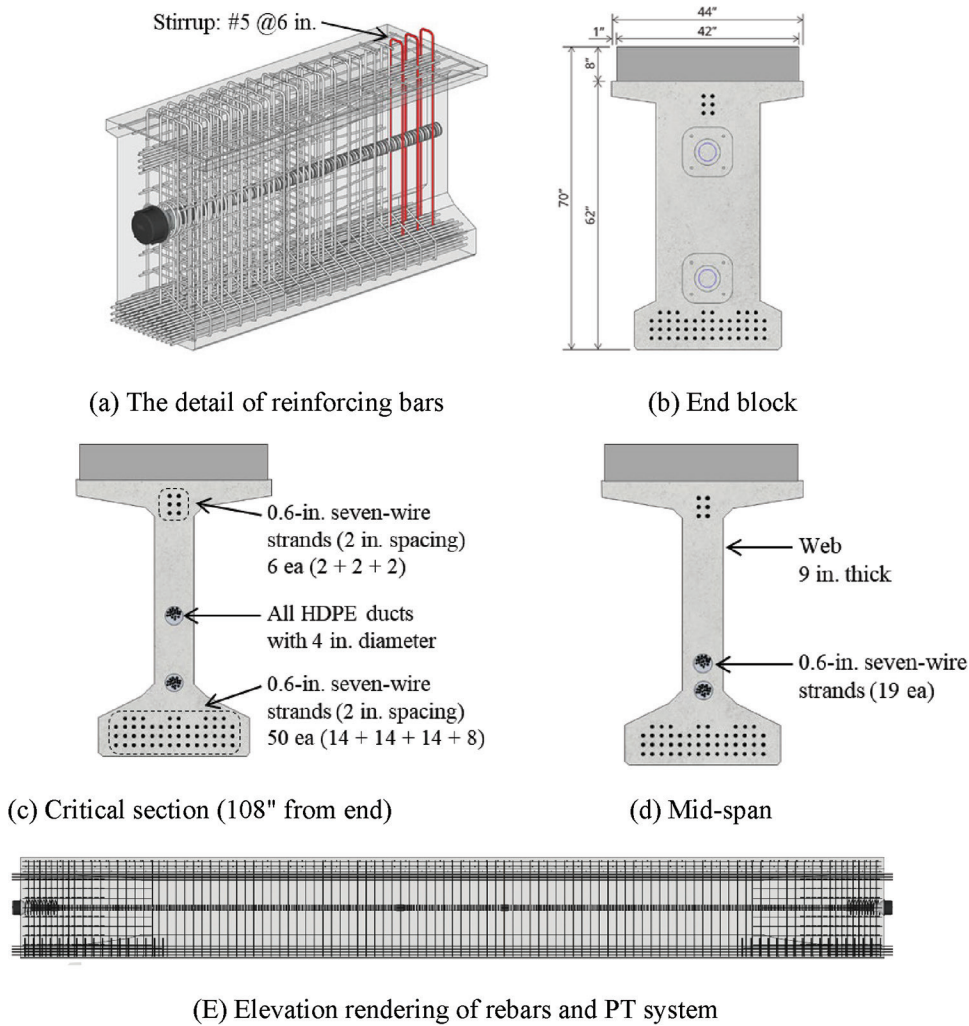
Details of reinforcing bars and cross sections of test specimens of Tx62-PSG and Tx62-PSU. (Note: 1 in. = 25.4 mm.)
